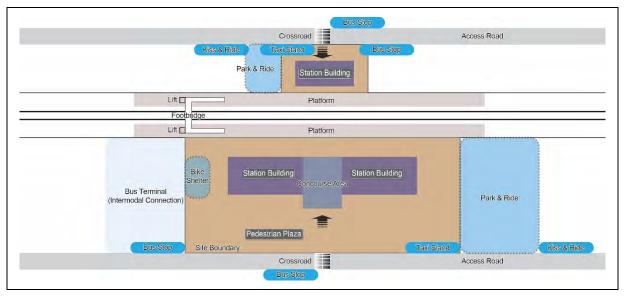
Prototype Site Plan of At Grade Type Large Station
